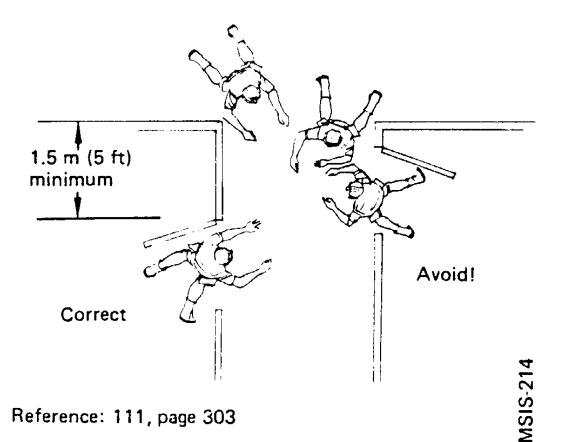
Place Door Openings Away From Traffic Congestion
